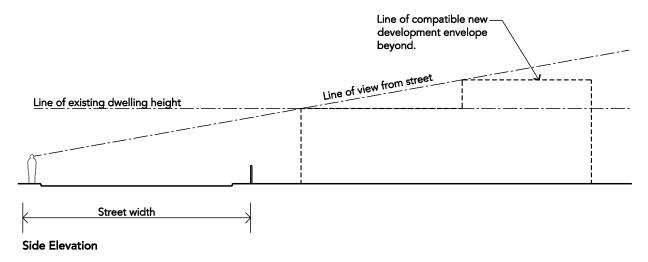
Side elevation illustrating compatible roof envelope — Griffiths Architects 2012.
